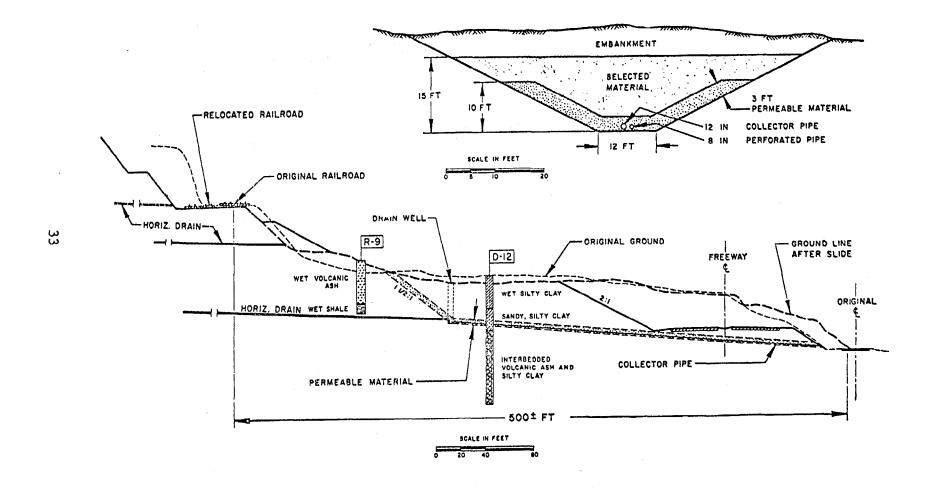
Profile And Typical Section of Drainage Trench At Towle Slide (35)
